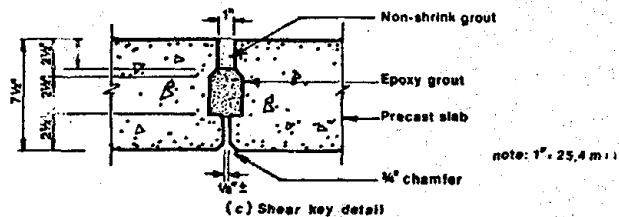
Rondout Creek bridge deck, Kingston, New York.
